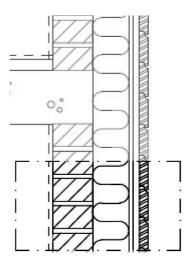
Structural section of a masonry building. The external wall consists of load-bearing masonry (approx. 130 mm), thermal insulation (approx. 100-150 mm) and exterior surface materials. This structure was mainly used in the 1980s (Weijo et al. 2019).
